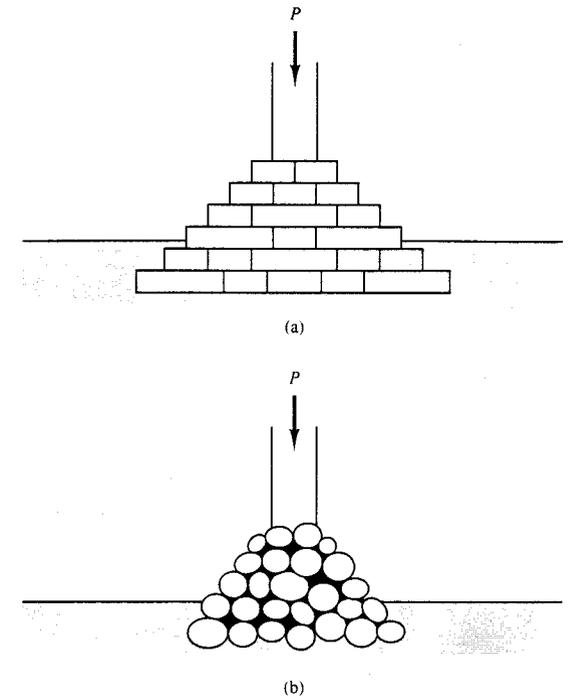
(a) Dimension-stone footing, and (b) Rubble-stone footing.
